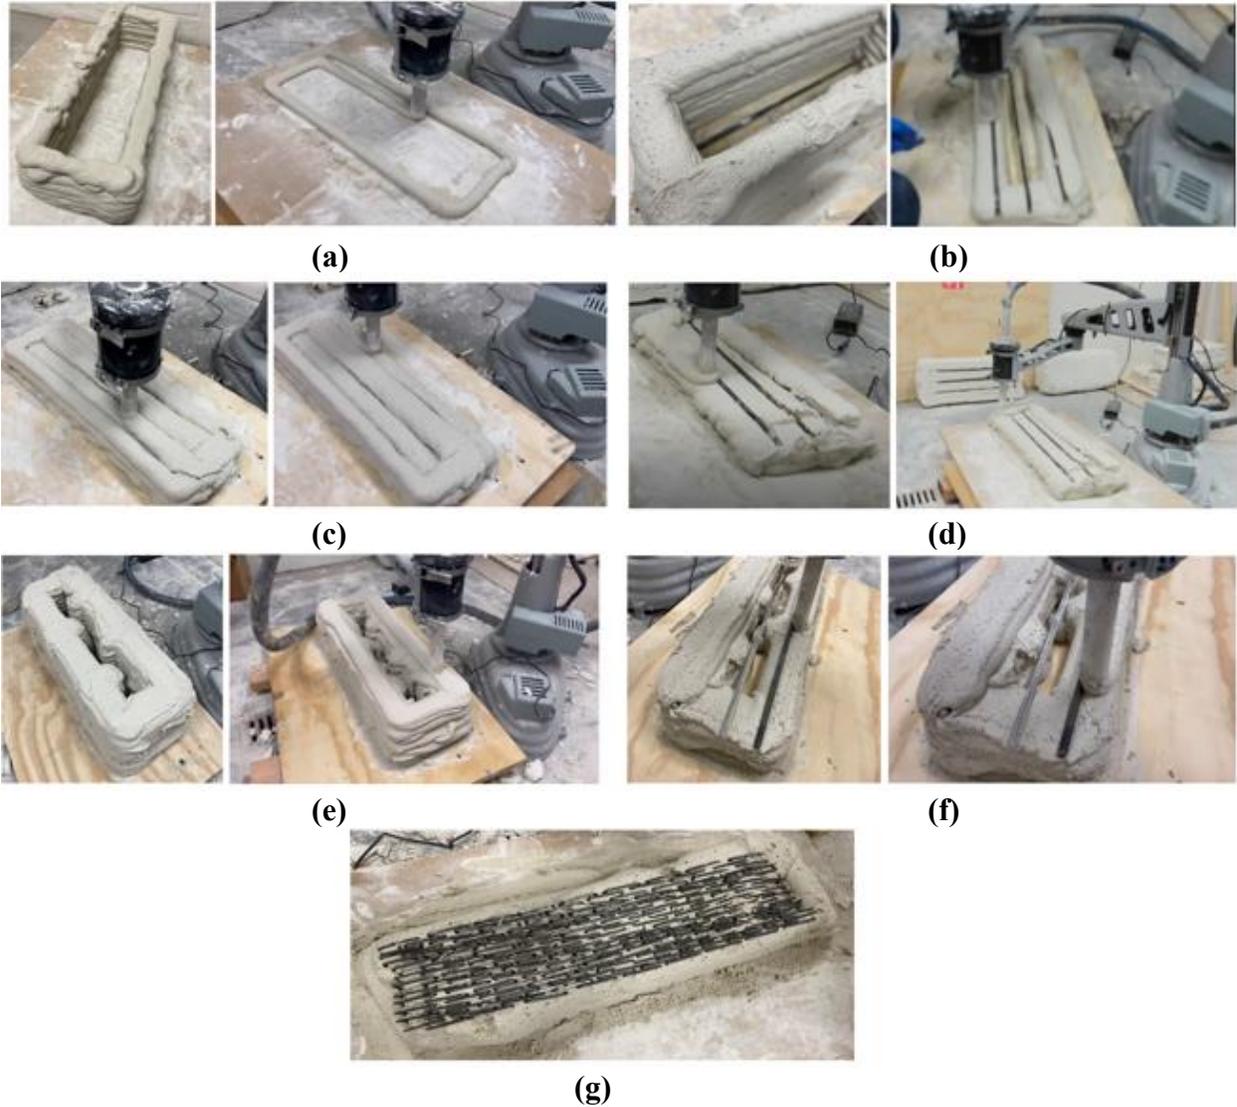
Beam fabrication printing process a) plain beam with printed formwork; b) rebar reinforced plain beam with printed formwork; c) plain beam with printed studs formwork; d) rebar reinforced plain beam with printed studs formwork; e) fully printed plain beam; f) fully printed rebar reinforced beam; and g) fully printed staples reinforced beam
